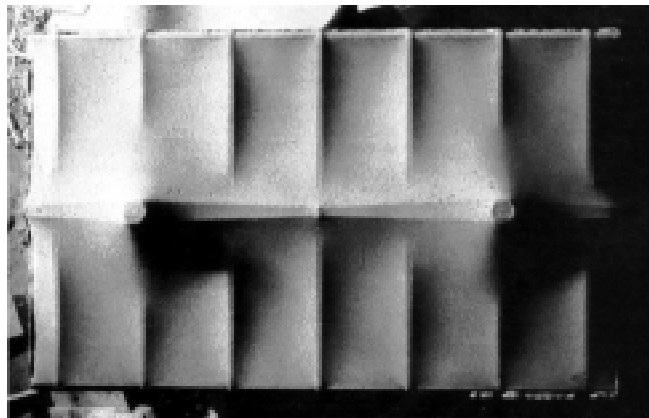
Model, showing underside of precast slab with integral variable section beams and compression shell/funicular arch geometries.
